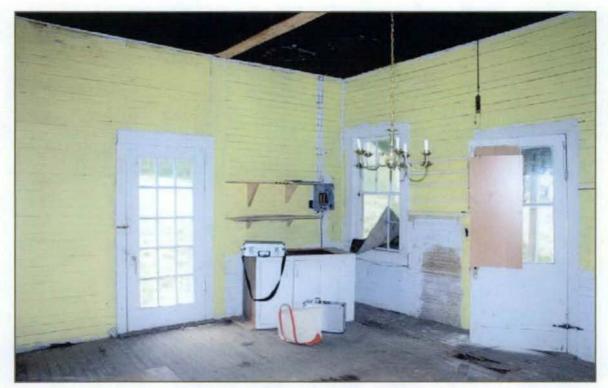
House, View #33, Interior, Room #101, Camera Facing Northwest
